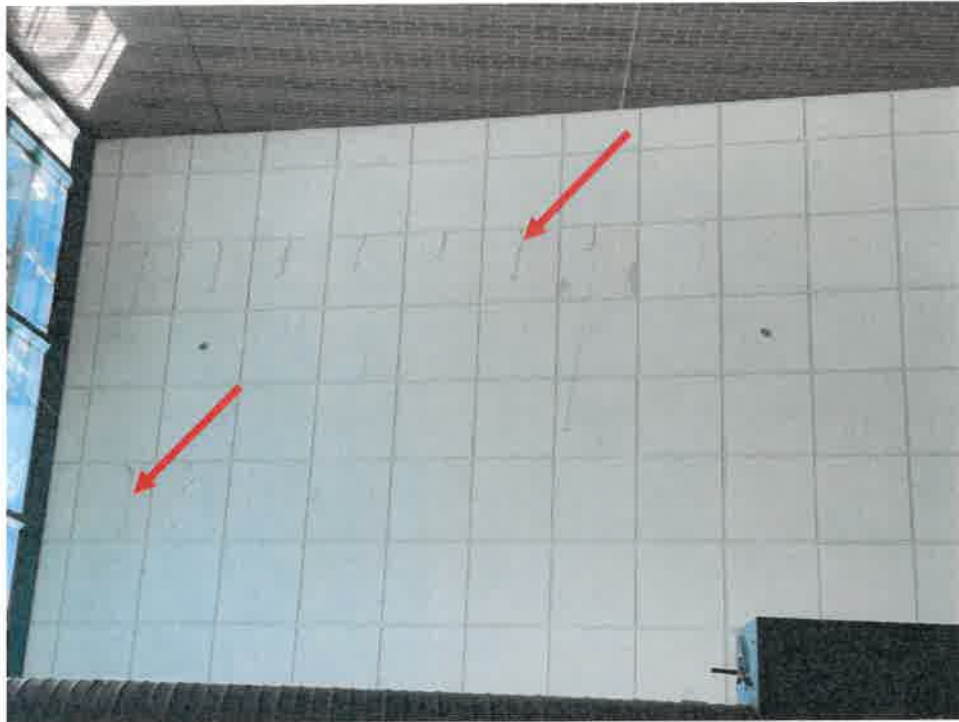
Visible moisture stains on lay-in ceiling tiles.
